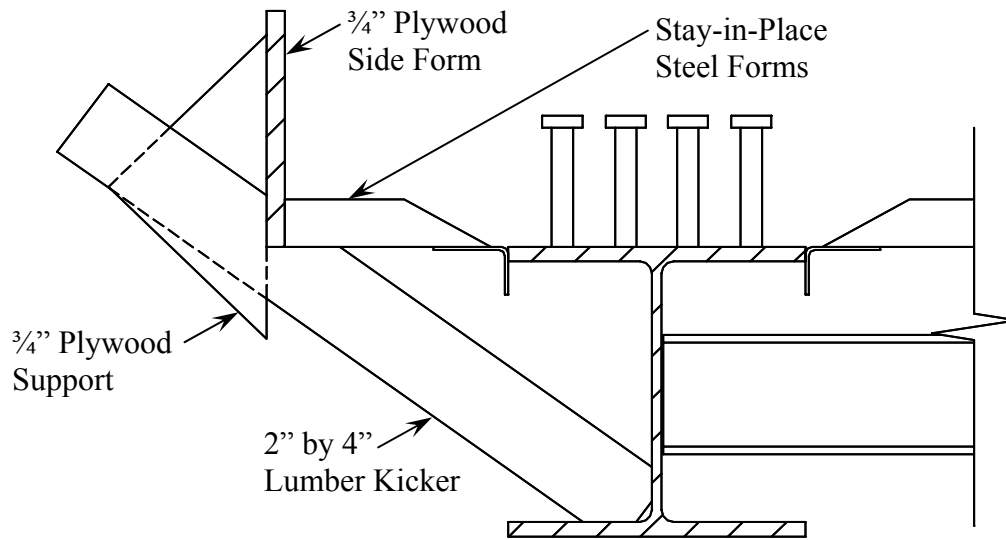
Kickers for Cantilevered Section of As-Built Model
